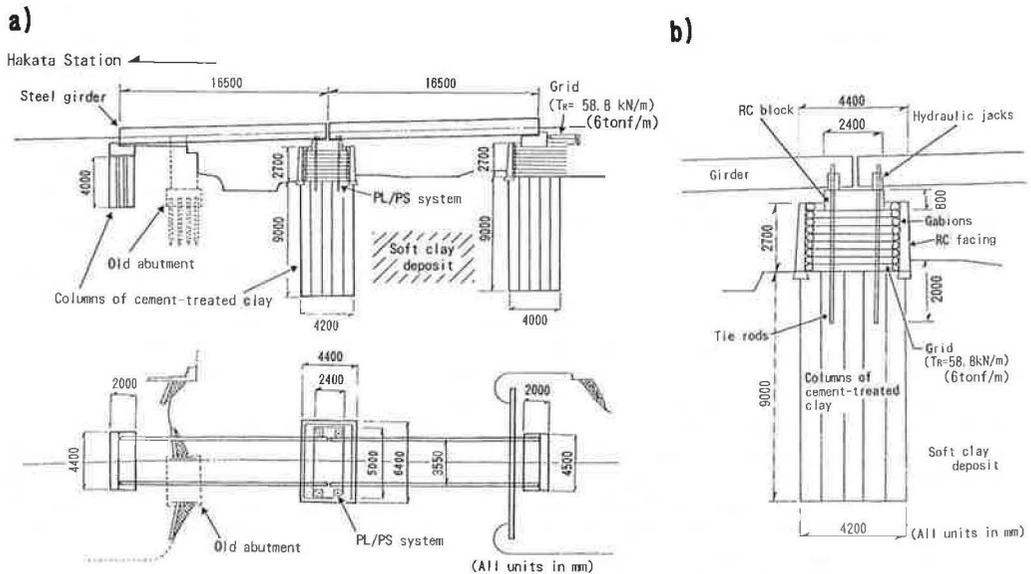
First PL/PS GRS bridge pier; a) general plan and b) details of the pier, the Sasaguri Line (No. 57 in Fig. 3)
